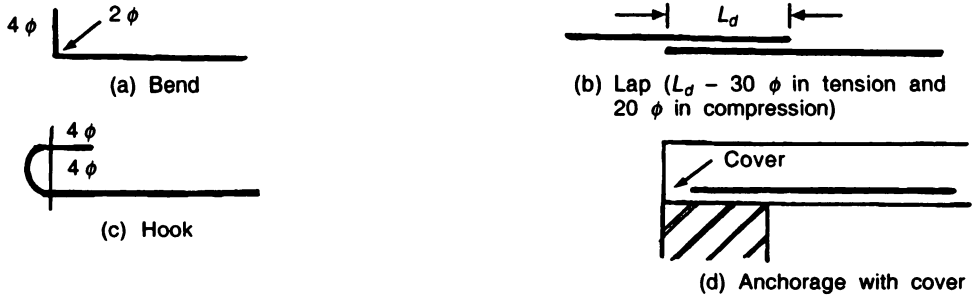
Bends, Laps, Hooks and Anchorage in reinforced concrete construction.
